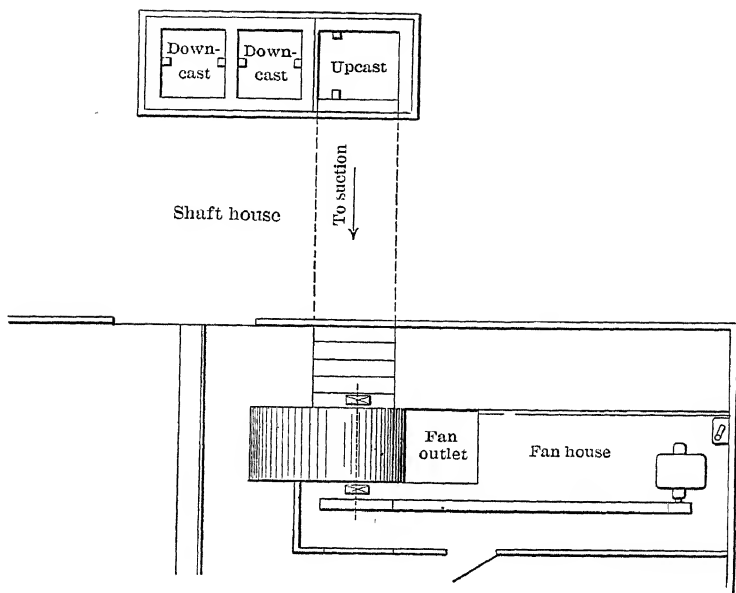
PLAN OF FAN AT WARD SHAFT.
